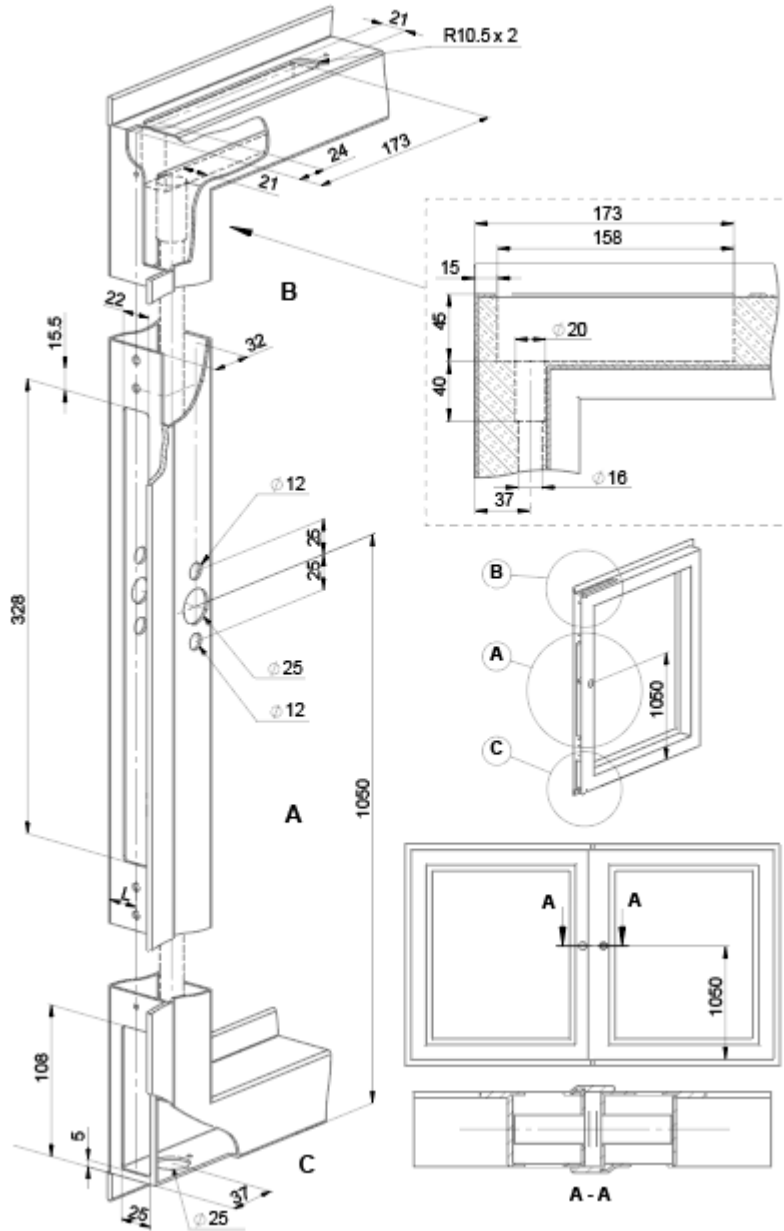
PE920, PE923 drilling. The lever handle/panic bar drilling are determined by the selected hardware.
